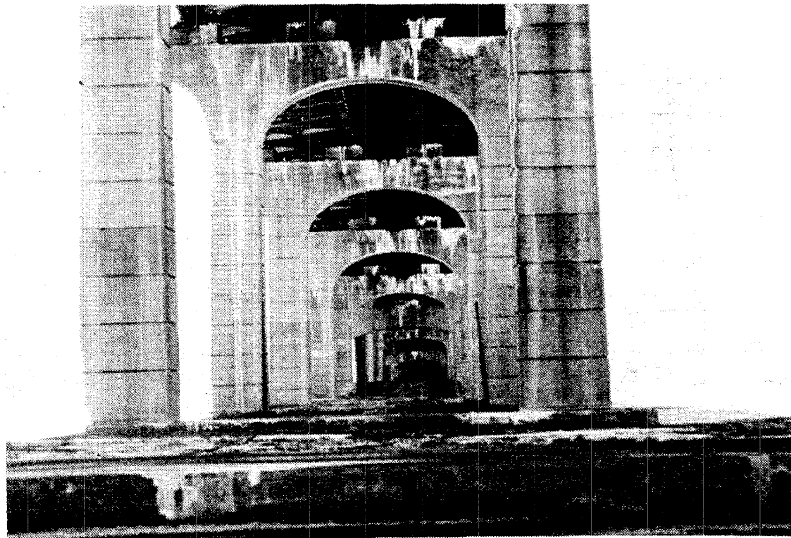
/ Salt Staining on Pier Bents, Burlington Bay Skyway
